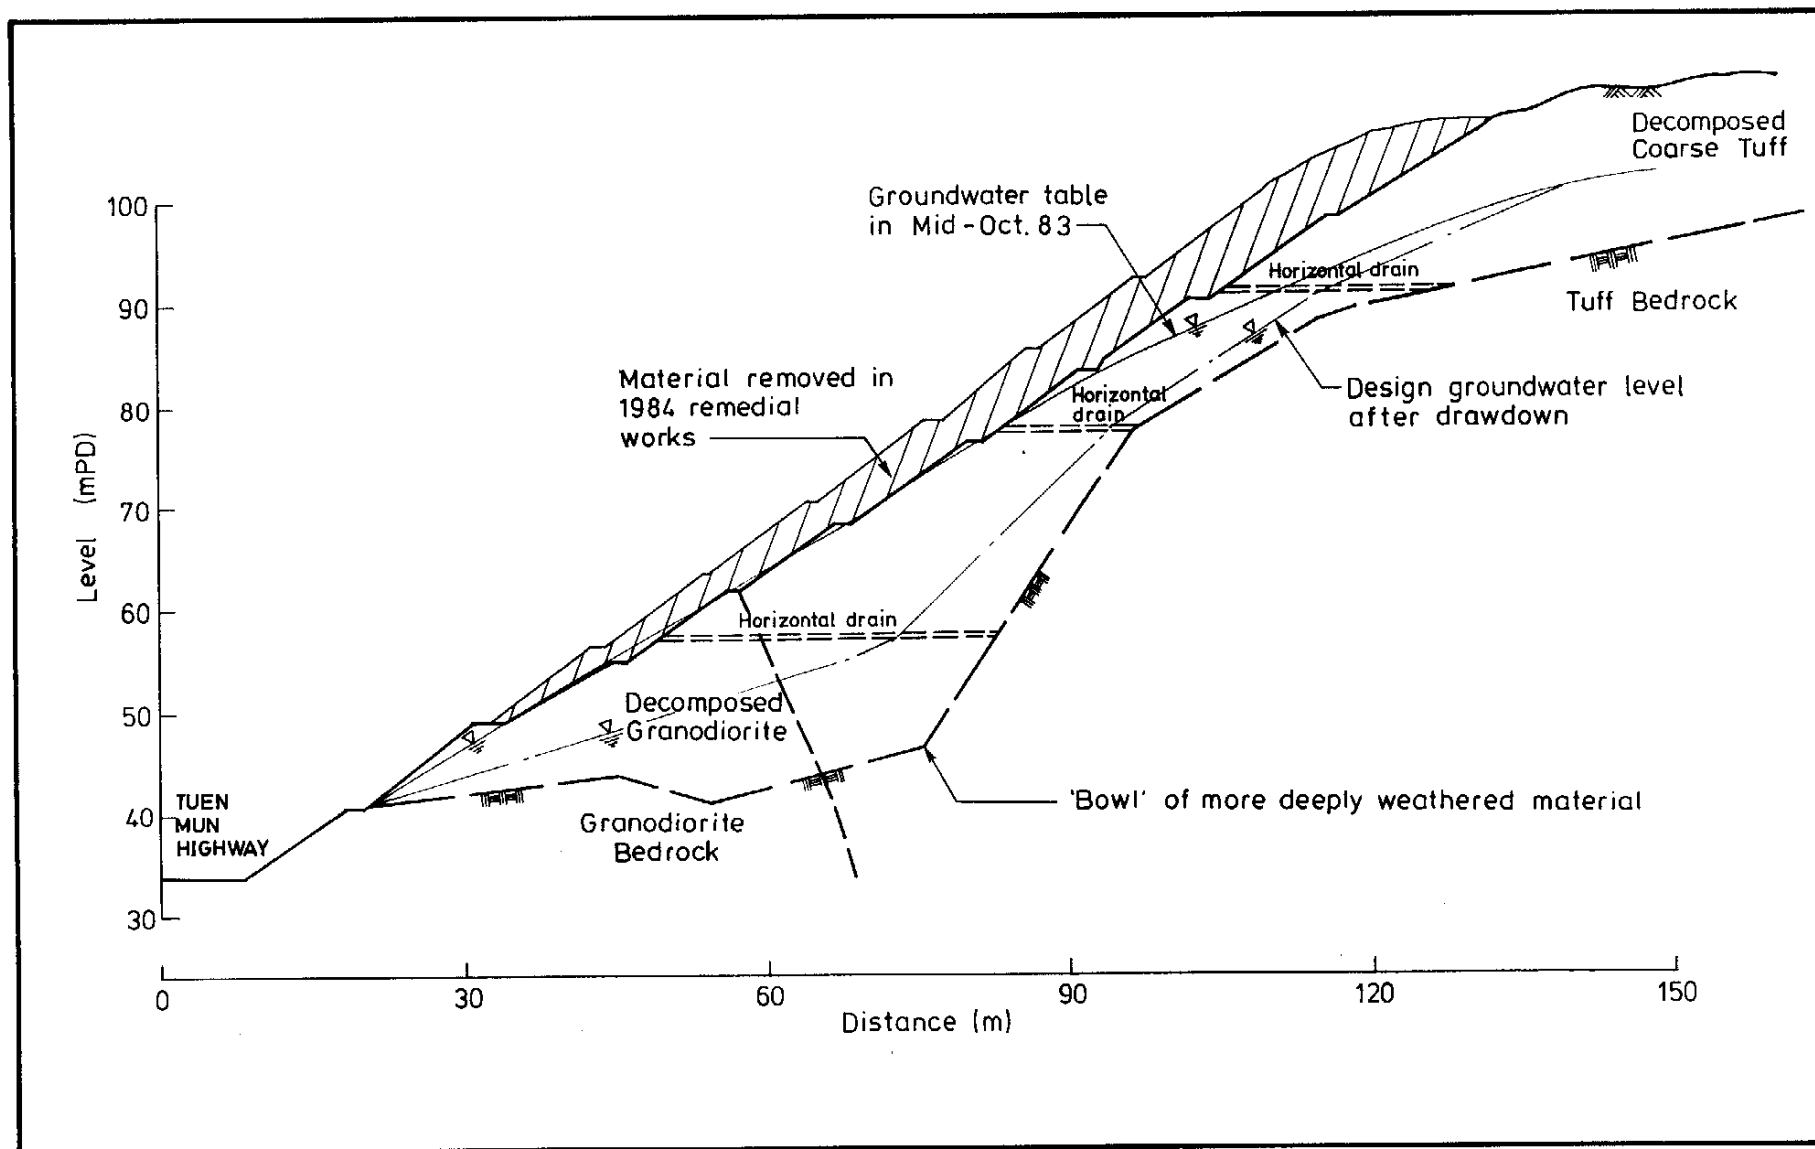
Typical Section Showing Ground Conditions and Positions of Horizontal Drains at Pun Shan Tsuen
